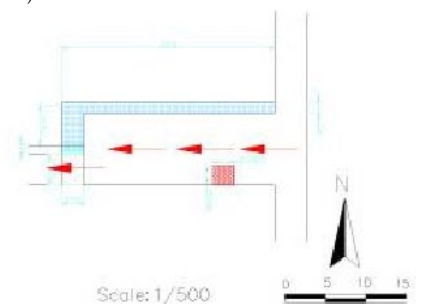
55 (above): marked parking spaces in front of Shibani church along Jalloum Kubra Street (source: Planco Consulting & DOC 2003)
